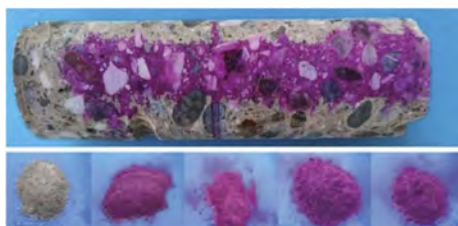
Phenolphthalein test on concrete core and concrete powders.
